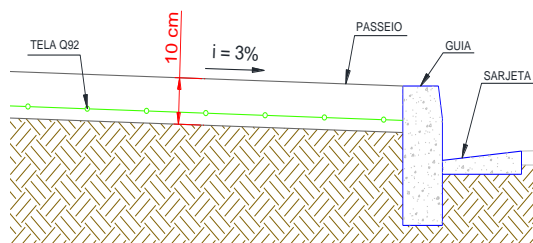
Transverse inclination of the sidewalk. Source: Own Author.
